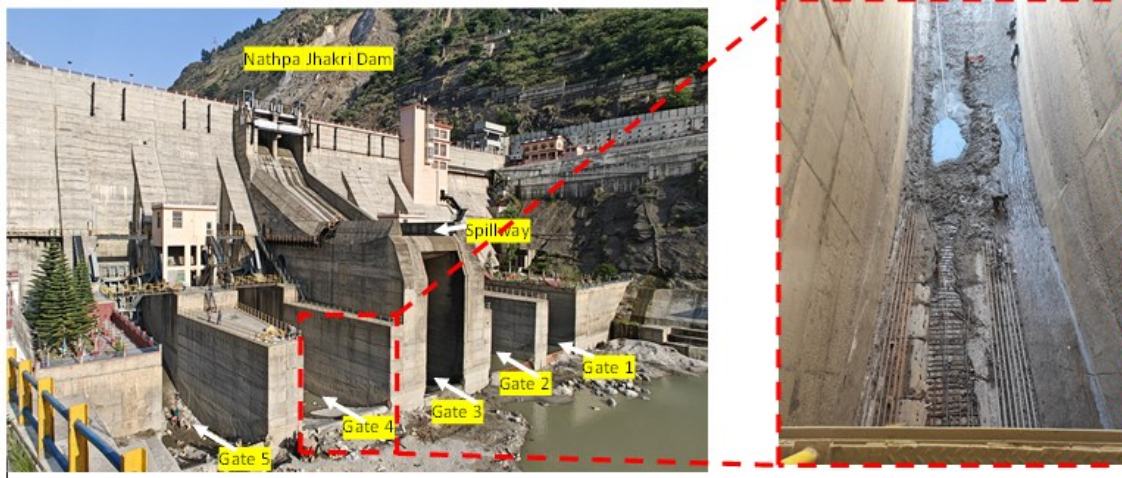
Location of sluice spillways and damaged spillway at Gate No. 4.
